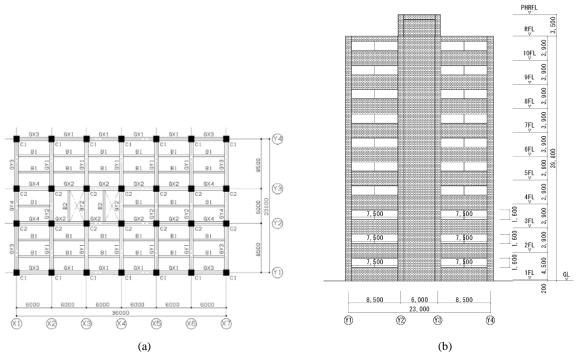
Case study structure: (a) plan view and (b) lateral view [14]
